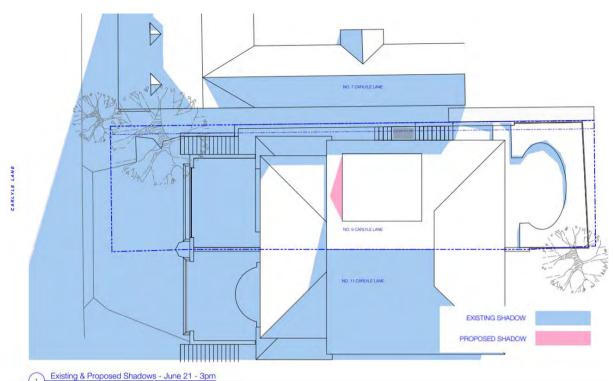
Shadow Diagram at 3.00pm at mid-winter (21 June) detailing shadow cast over the roof of the semi-detached
